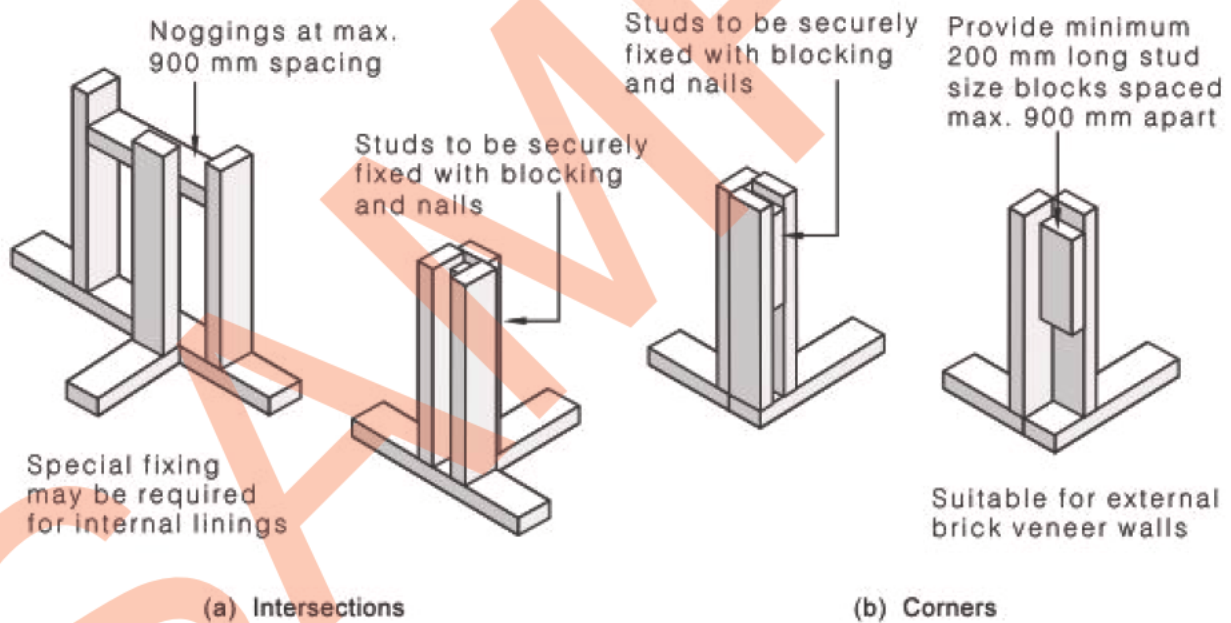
TYPICAL WALL JUNCTIONS
